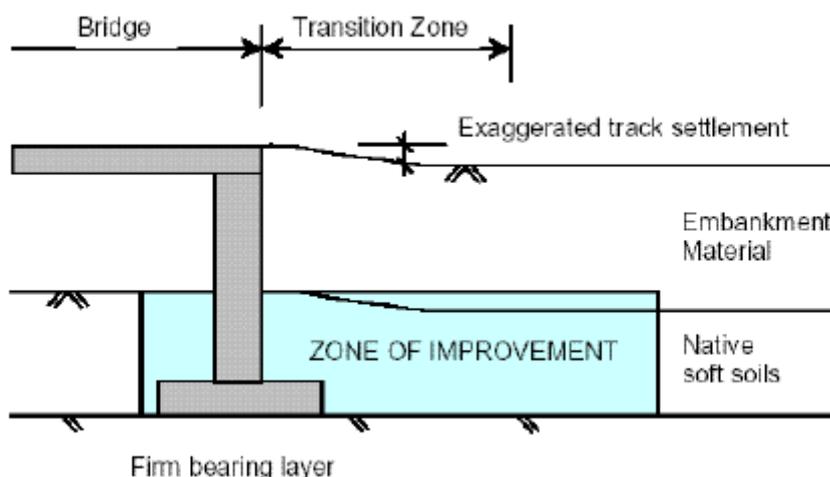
Principle sketch of zone of improvement at shallow foundation of bridge abutment
